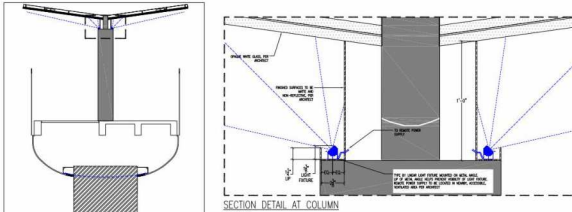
SUNNYVALE OVERPASS BRIDGE LIGHTING AT SLAB APERTURE
